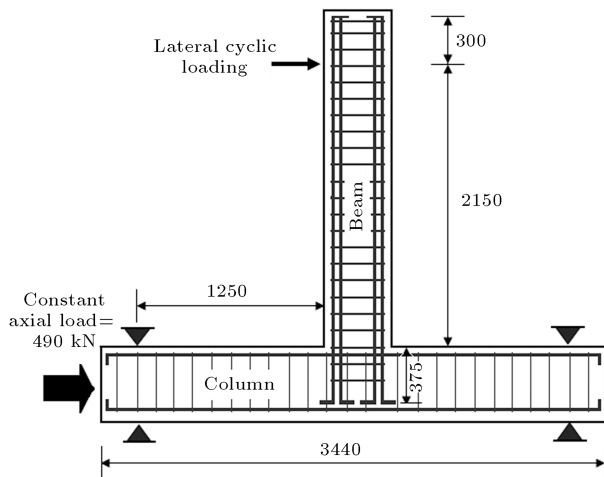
Geometry of the Specimen 3 (all dimensions in mm) [28].
